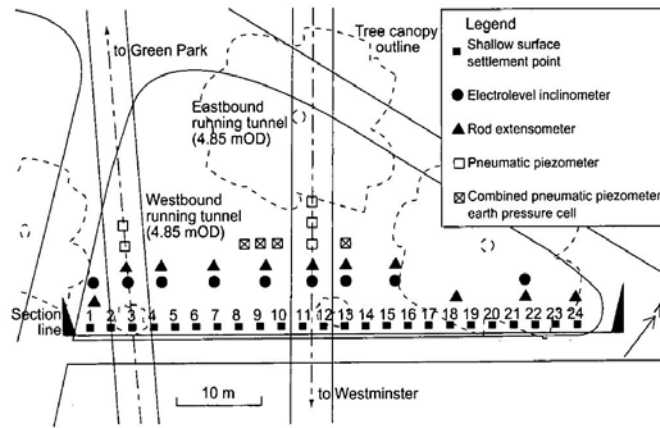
Instrumented section and tunnel position, source Burland and Standing (2006).
